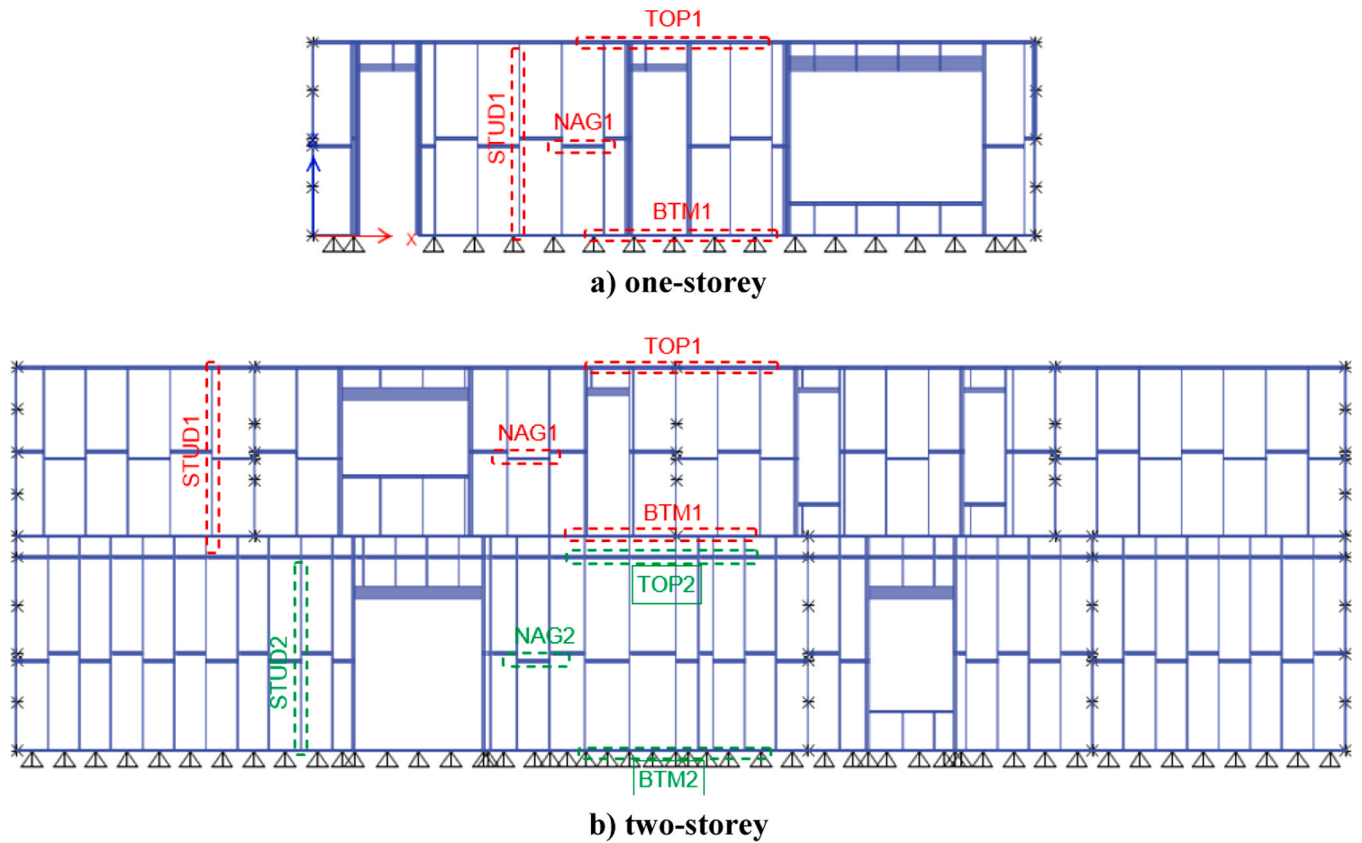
Framing elevations of 3D model. categorising convention for outcomes. STUD1: studs in the 1-storey building and the upper storey of the 2-storey buildings; STUD2: studs in the lower storey of the 2-storey building; TOP: maximum internal forces in the top plate; BTM: maximum internal forces in the bottom plate; NAG: maximum internal forces experienced by the noggings.
